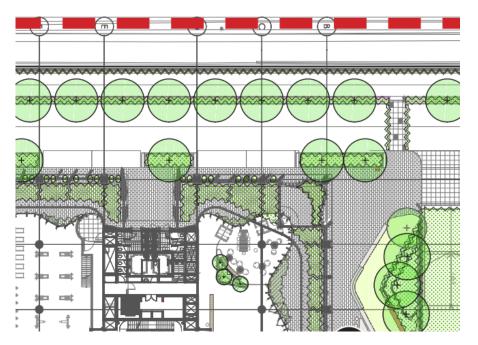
Extract of landscape plan showing cycle way and pedestrian pathway will be located between the wall running parallel to the railway line and narrow planted median strip which separates pedestrians and cyclists from cars. Source: Submitted Landscape Plan
